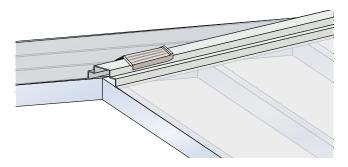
Ridge hip tile and Angle trim installed over a ridge accessory
